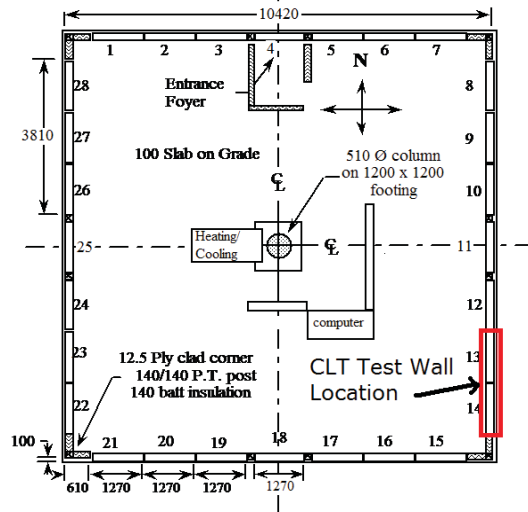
CLT Wall Location in Building Envelope Test Facility
